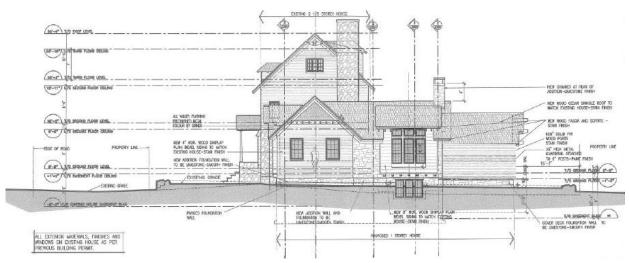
South elevation illustrating the proposed one storey addition and enclosed deck. Source: 2022 revised Building Permit Set Arc Associates Inc.
